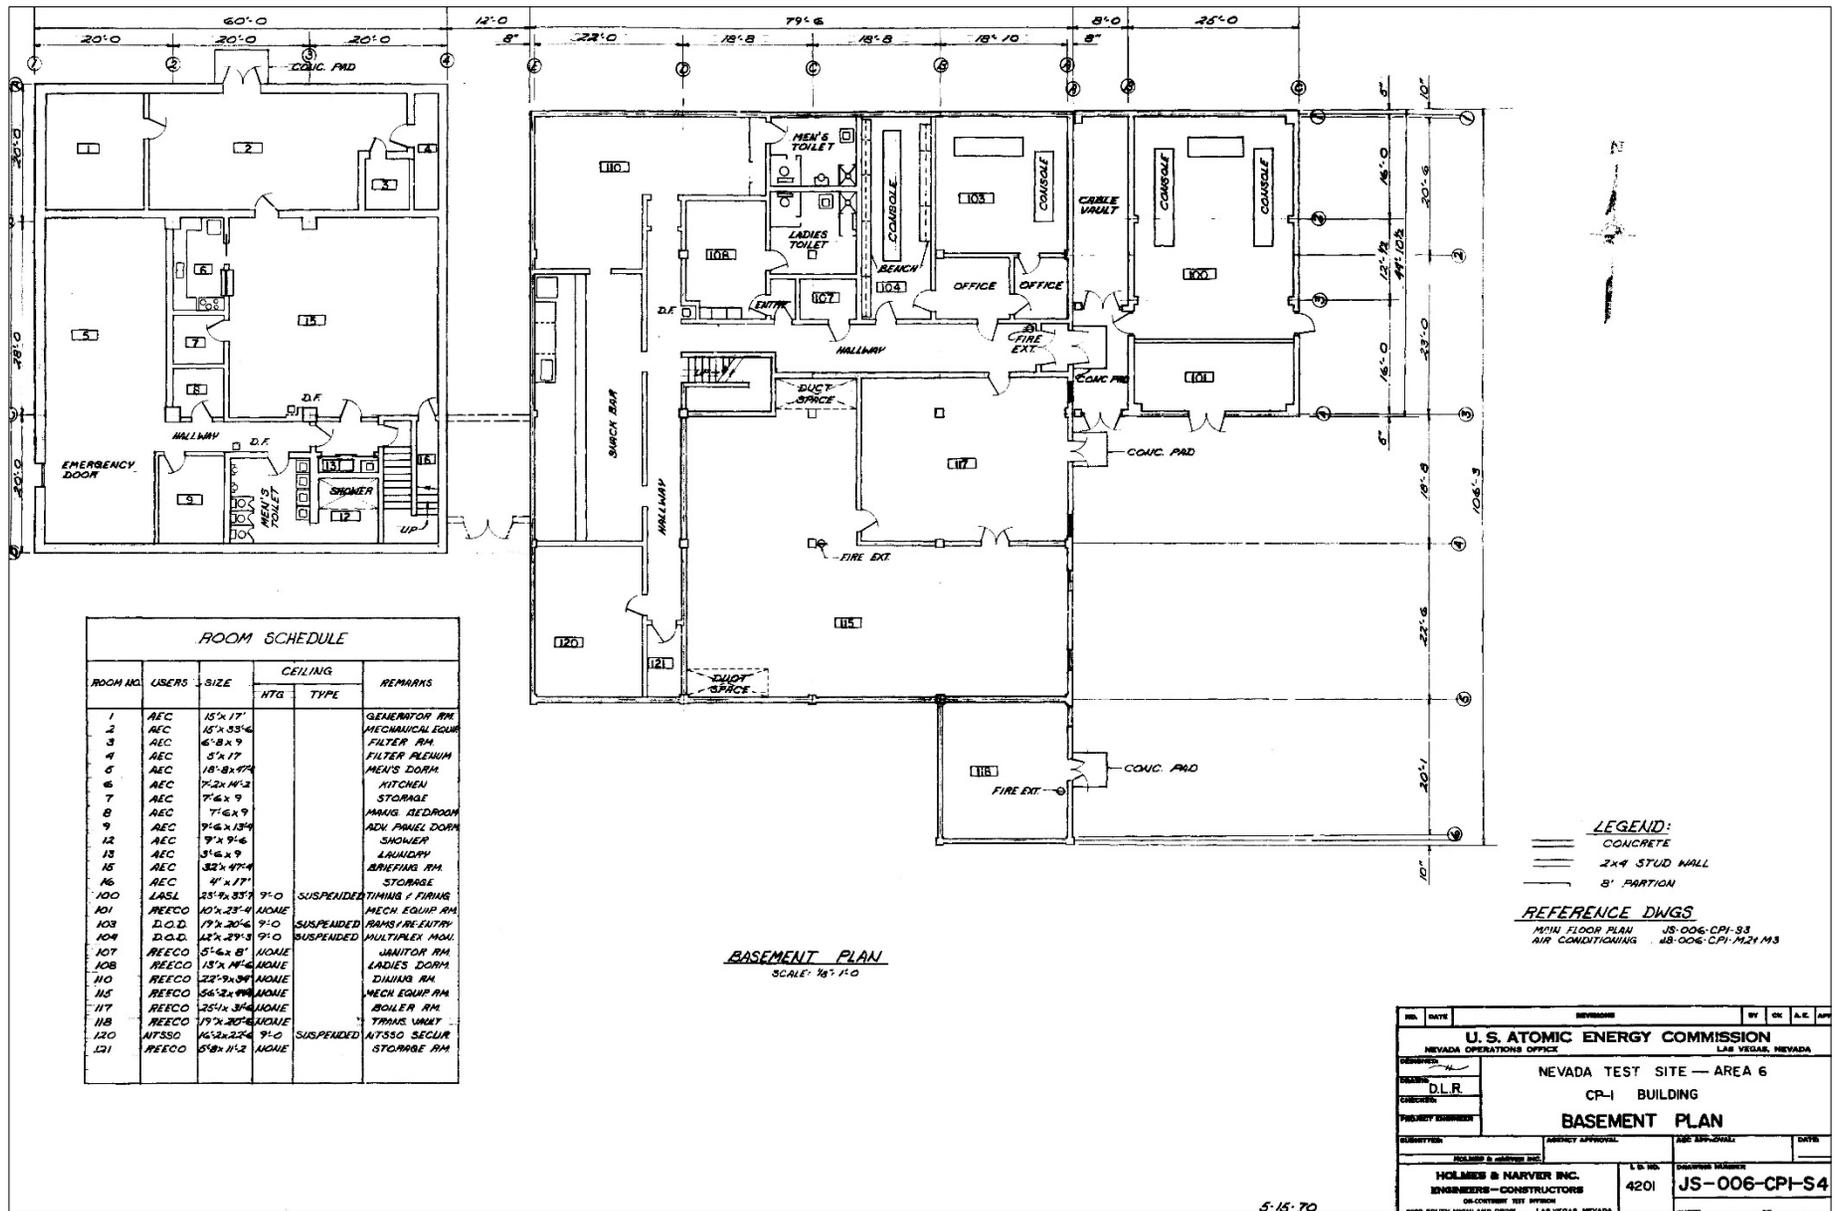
Basement floor plan early in 1970 prior to the Bechler modifications (drawing JS-006-CP1-S4 on file at the Archives and Records Center, Mercury).
